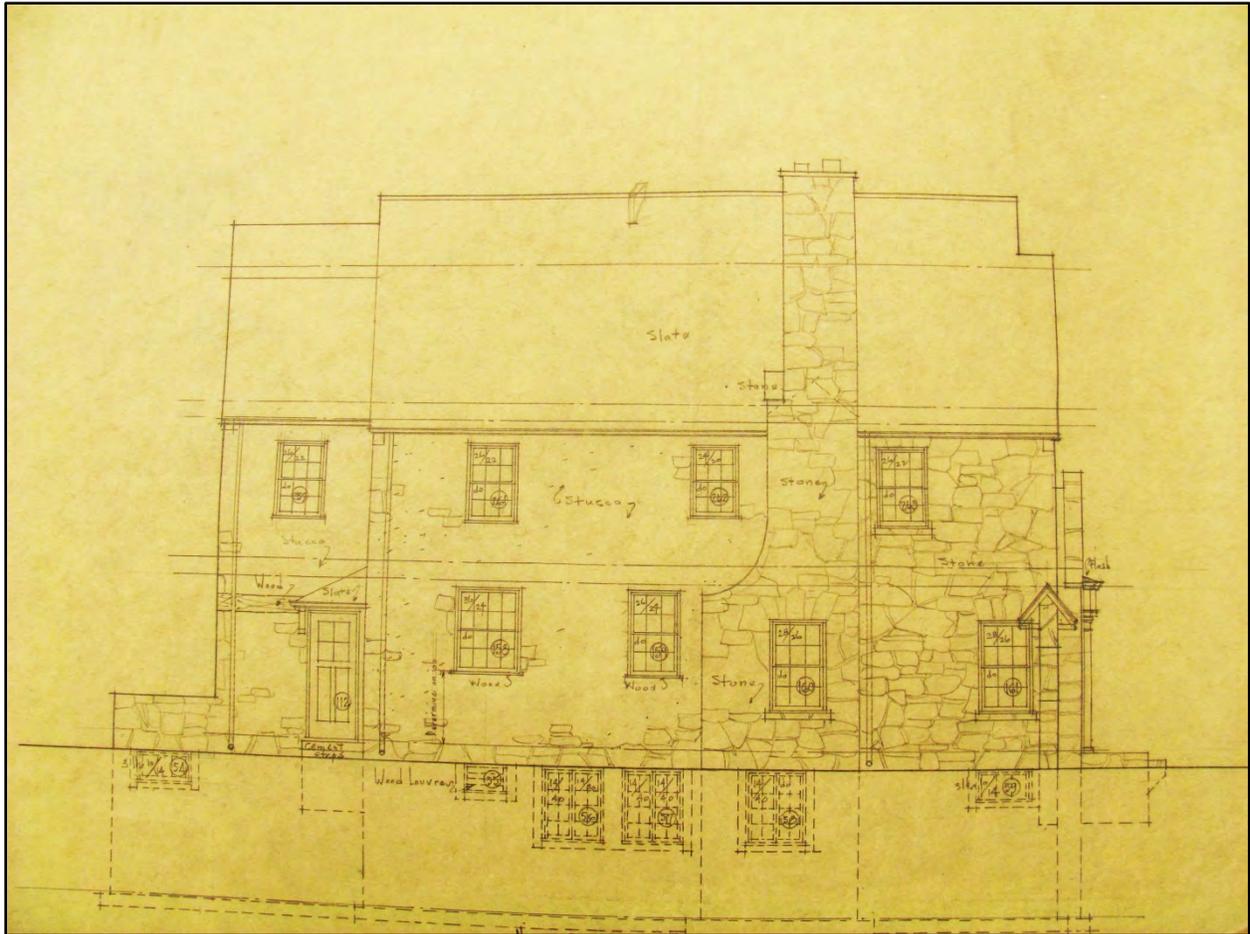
Amos Samuel Deinard Residence, 1729 Morgan Avenue South North (side) elevation plan, scanned by Robert Glancy May 2011, source: "Liebenberg and Kaplan Papers 1919-1969," Northwest Architectural Archives, University of Minnesota
